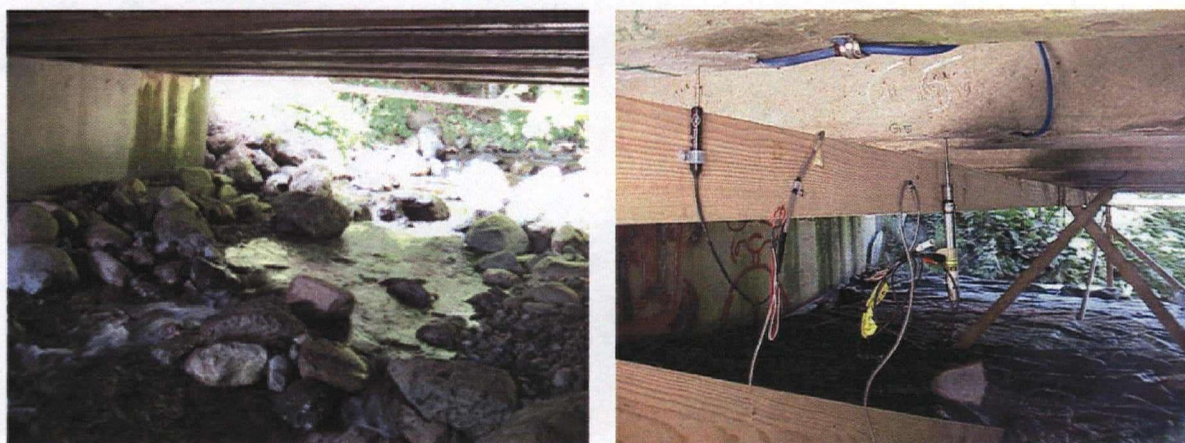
Photos Under Safe Bridge and the LVDT Set-Up for Before\_Repair\_2001
